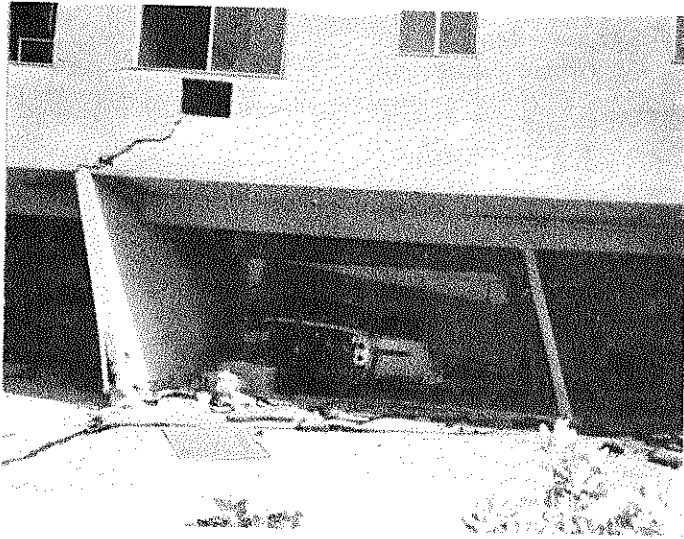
Another view of the apartment building in Figure 5-6, showing severe lean.
